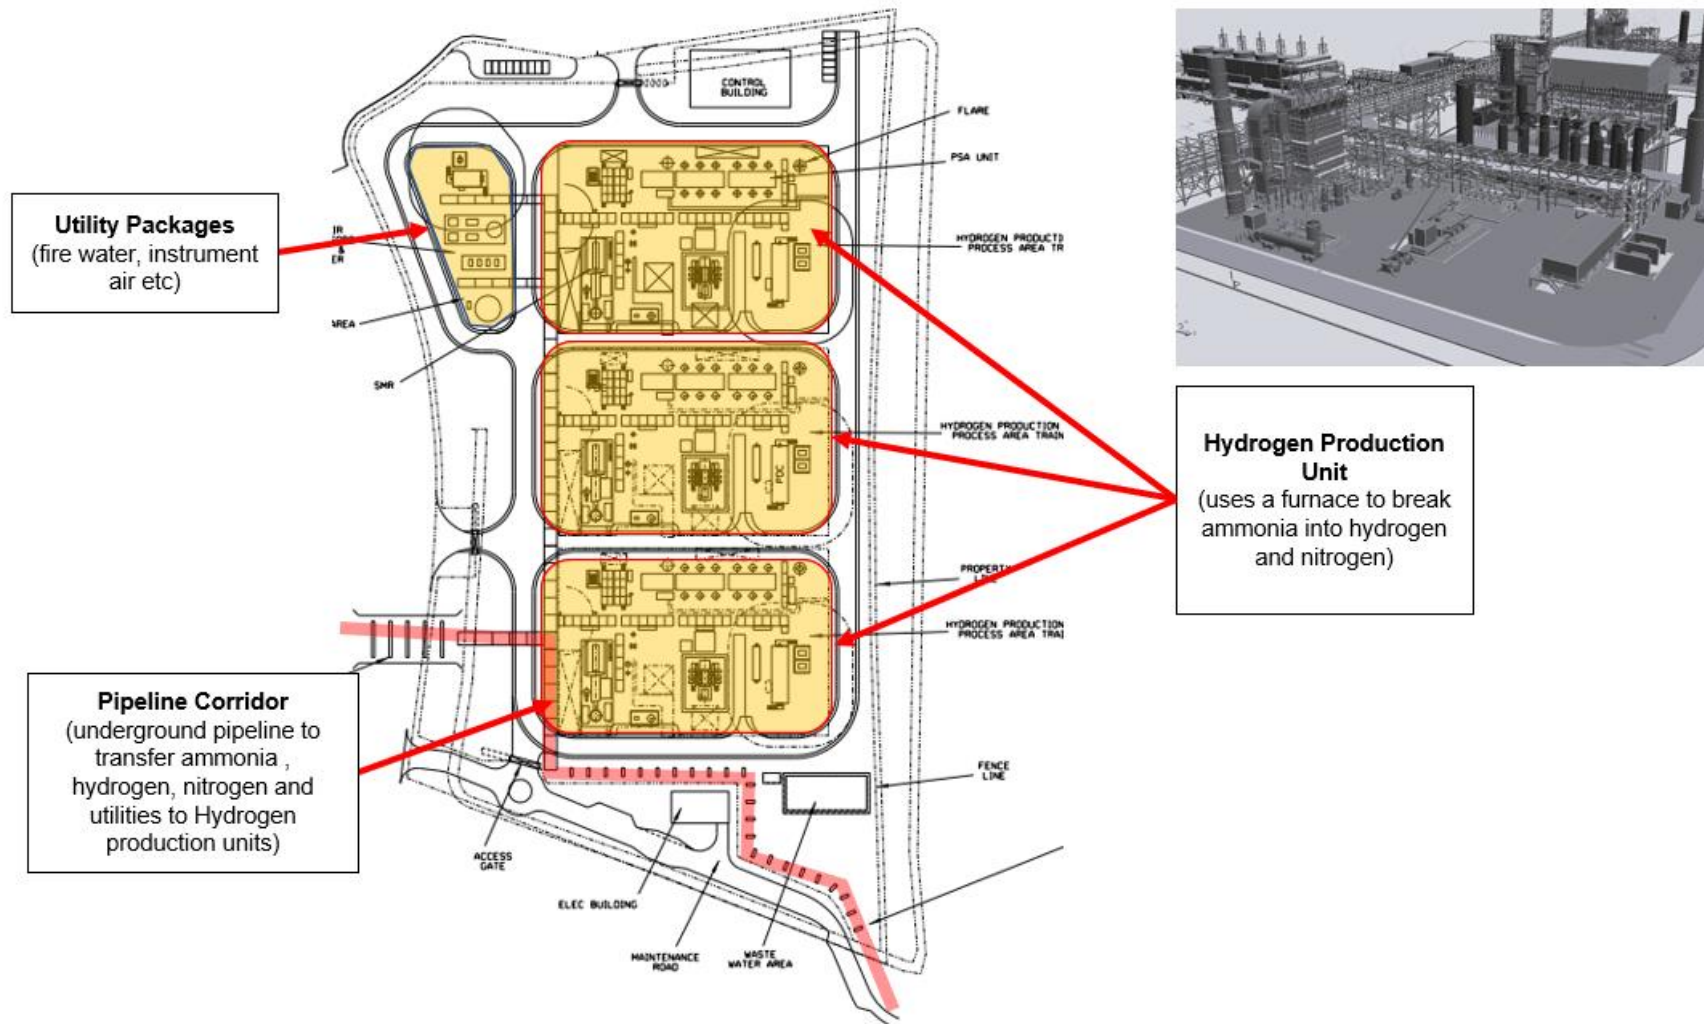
Illustrative Layout and Section of Work No. 5 on East Site, north of Laporte Road
